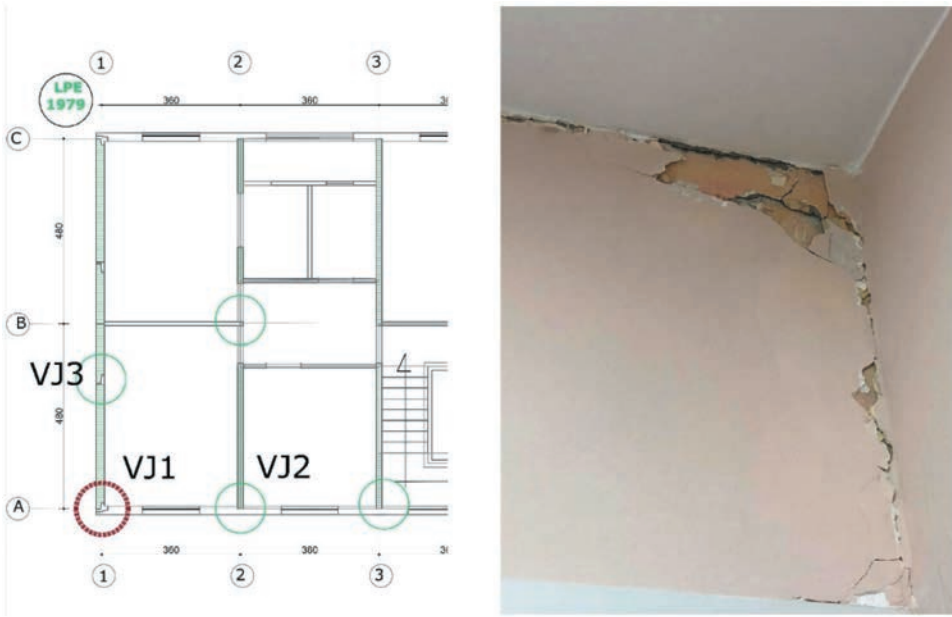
Cracking along the vertical joint VJ1 and horizontal joint (in longitudinal direction).
